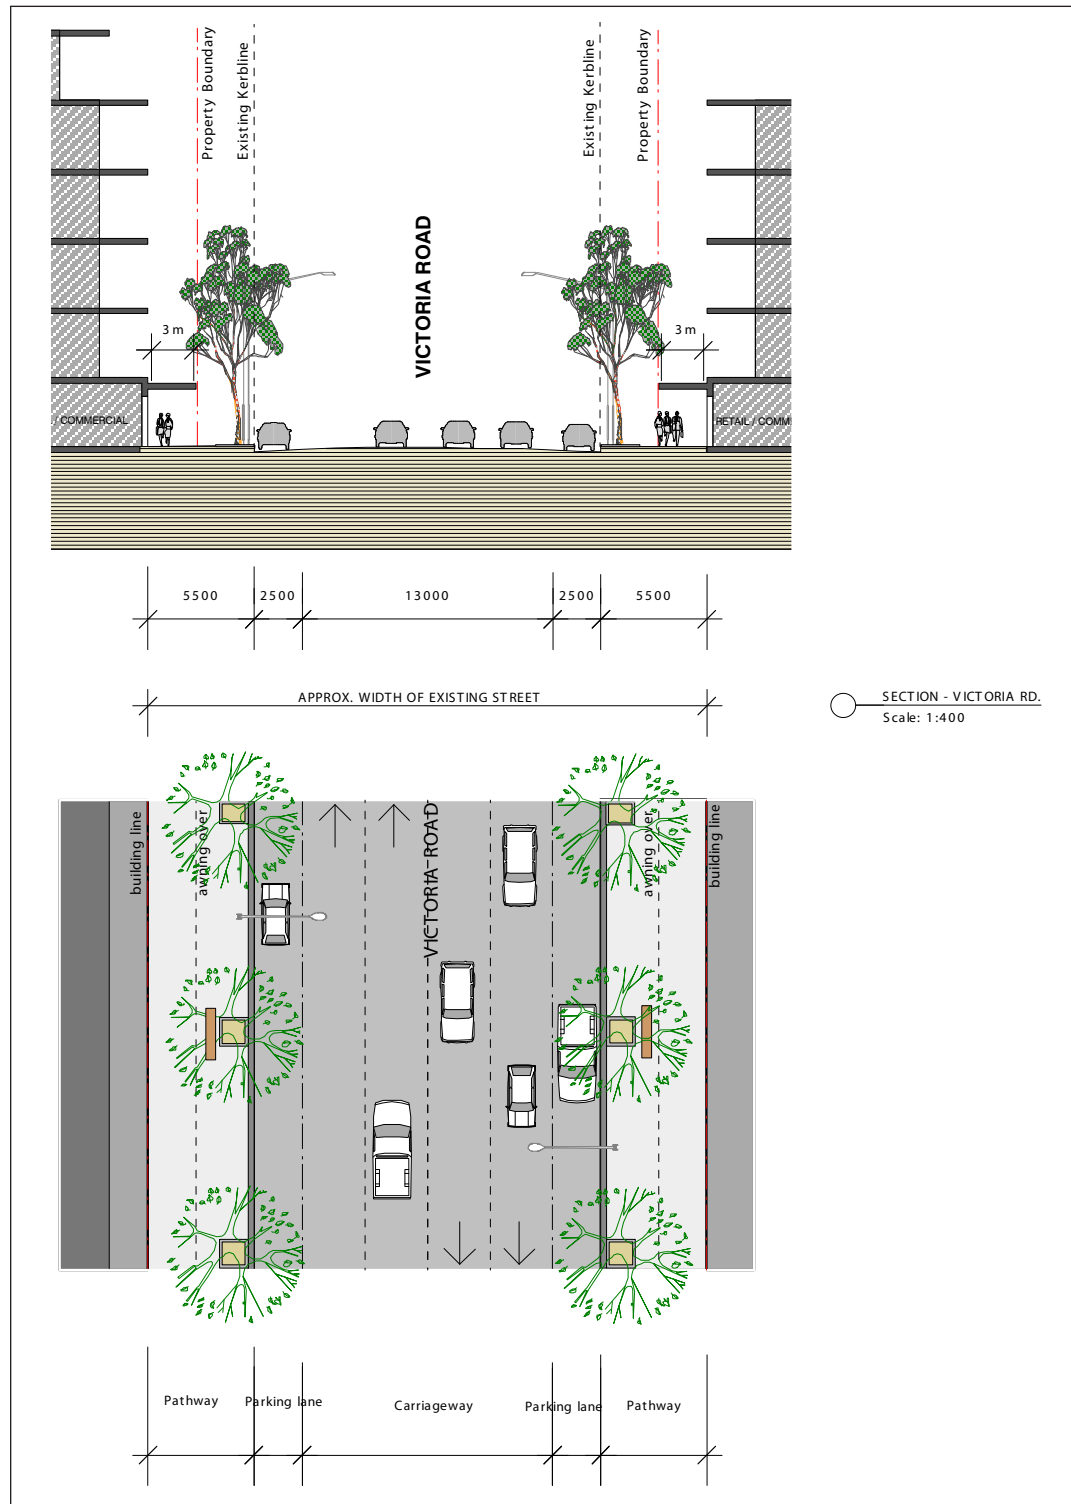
Victoria Road Section - North and South Gladesville Precincts
